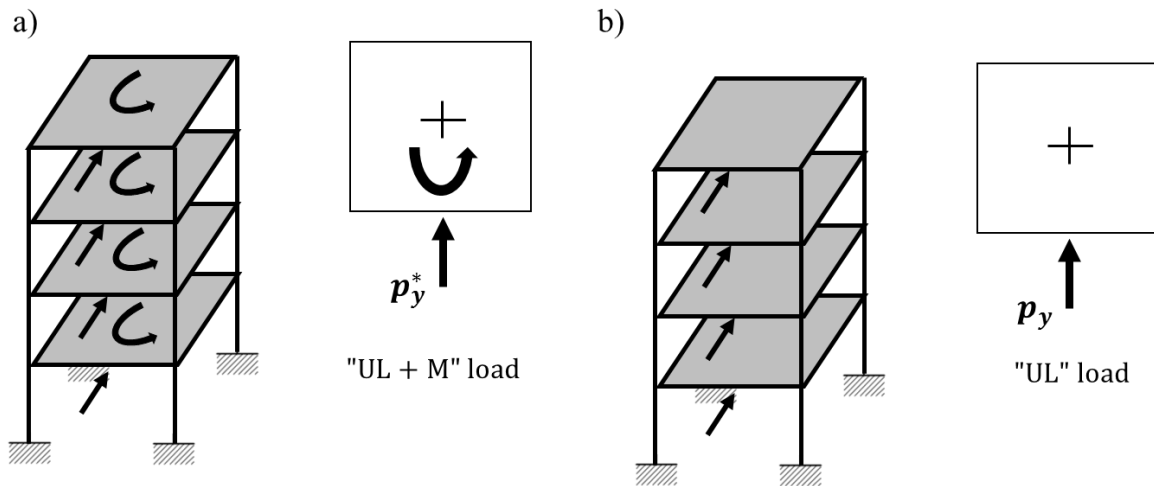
Inspection loads applied to the building structure in  $y$  direction:
